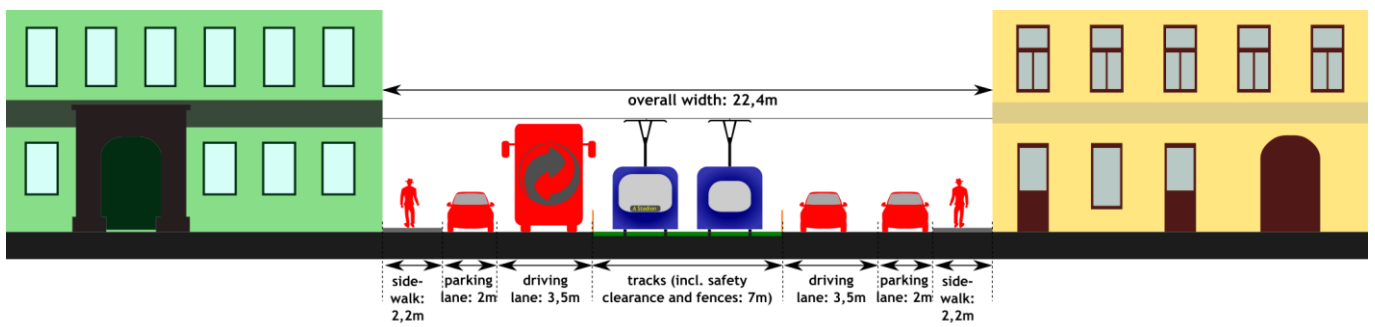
Minimum required street cross-section for a double-track LCRT line, a driving lane, a parking lane or loading zone and a sidewalk on both sides (situation apart from level crossings)
